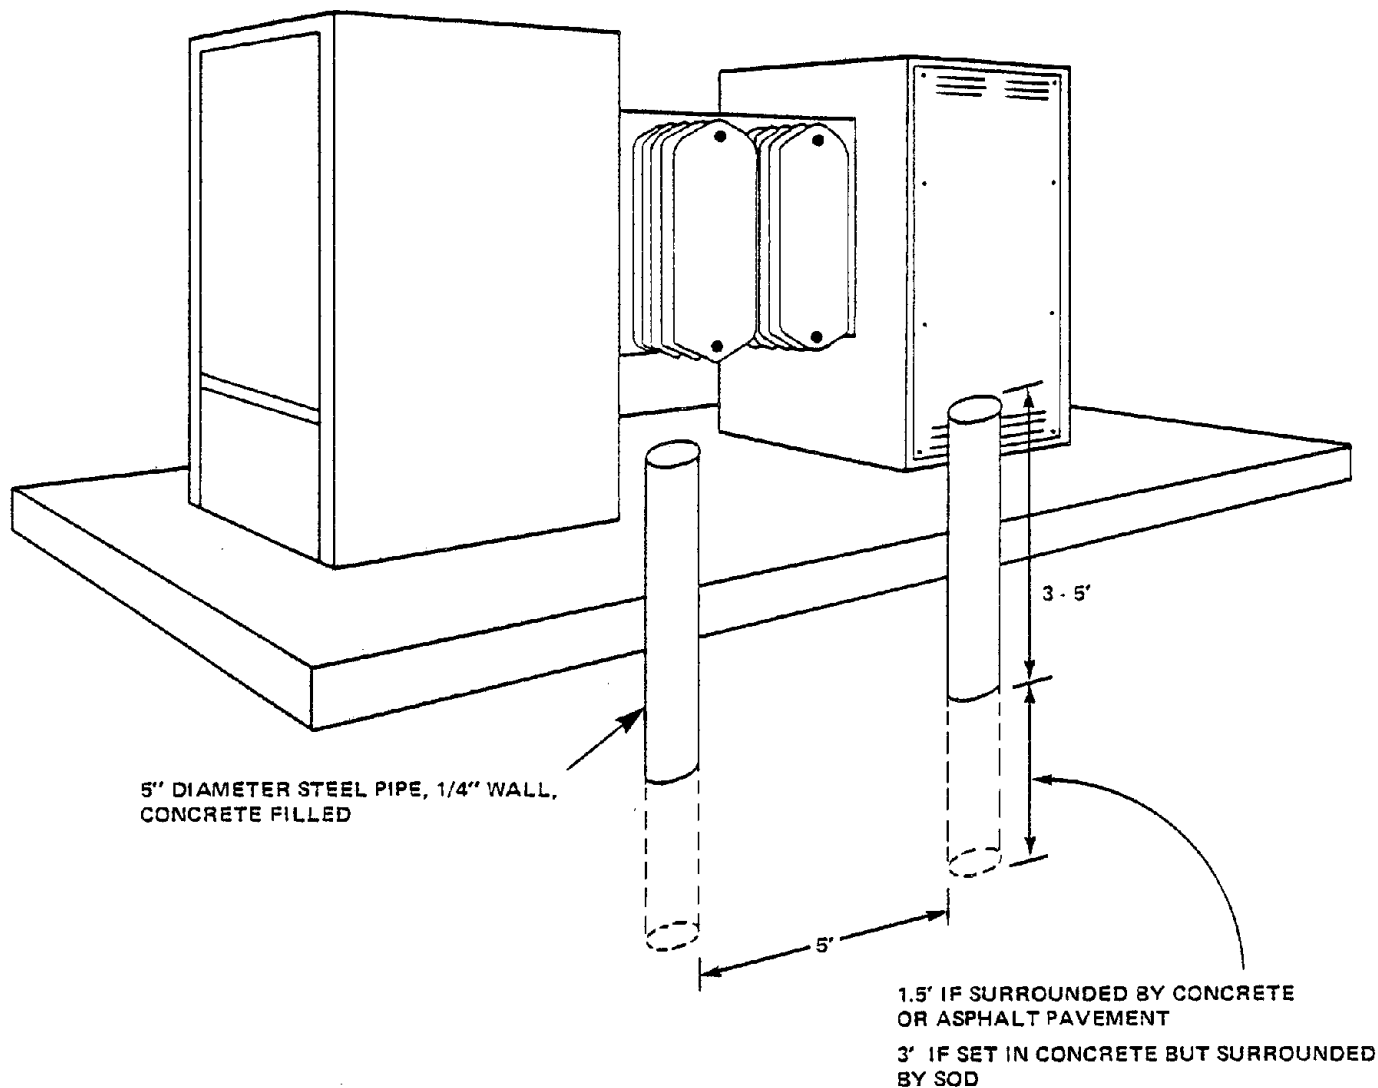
Vehicle barrier suitable for protection of an askarel transformer located in a parking lot or next to a street. Similar barriers used for protection against fork-lift type vehicles would have to have the pipes situated closer together and could be made using 3-inch diameter pipe (concrete filled).
